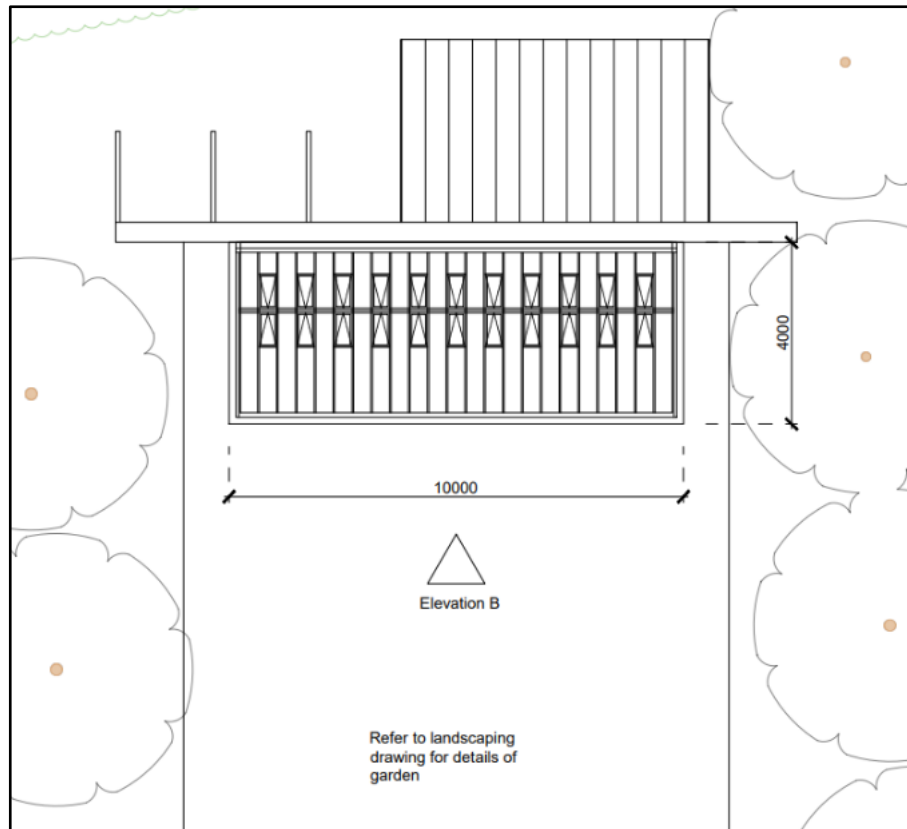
PROPOSED INTERNAL FLOOR PLANS OF GREENHOUSE AND ASSOCIATED STORE (CLAGUE ARCHITECTS)
